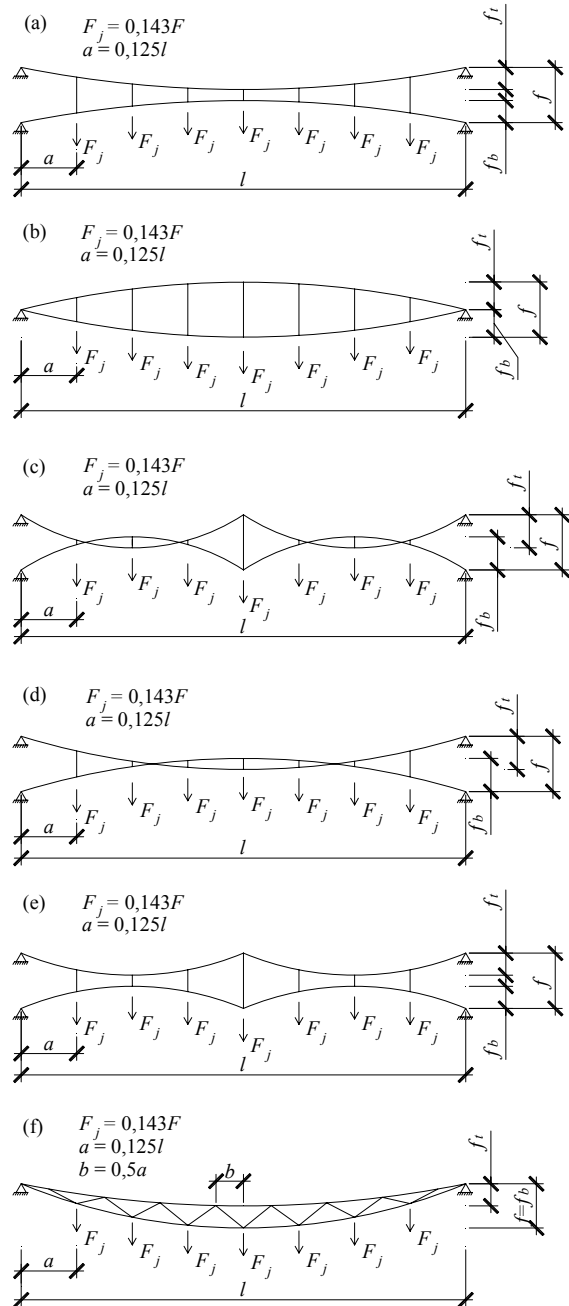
Types of cable trusses. (a) – Cable truss with suspensions; (b) – Cable truss with studs, (c),(d),(e) – Cable truss with suspensions and studs; (f) – Cable truss with tensioned elements. a – distance between load, l – span, F – load, f – truss height, f_b – bottom chord camber, f_t – top chord camber
